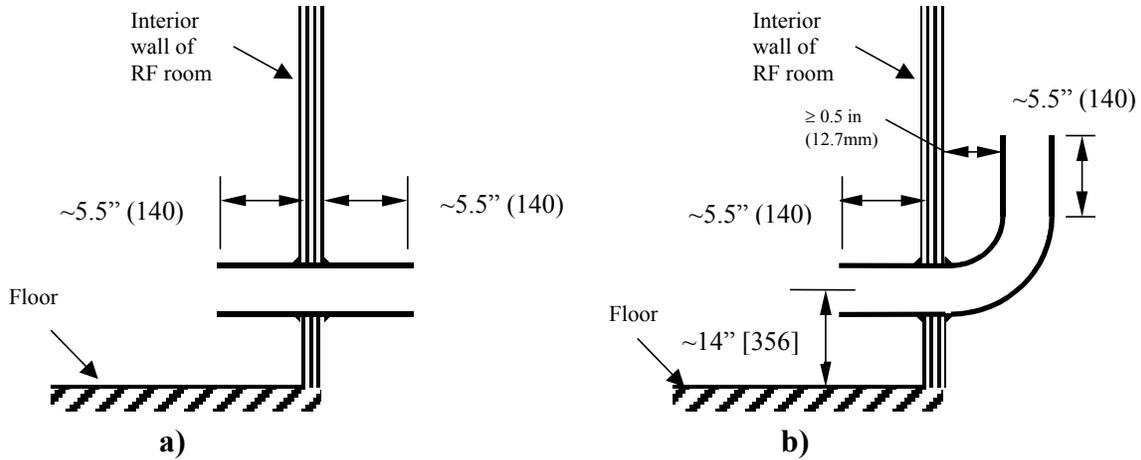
Side View of Vent Tube Penetration through RF Room Wall
